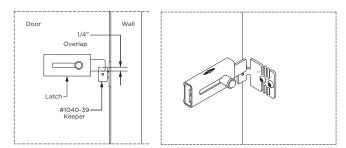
Outswing Door Wall Mount Keeper Installation Detail.
